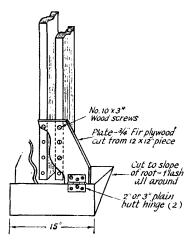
Sketch showing the hinging arrangement at the base of the lower mast section.
